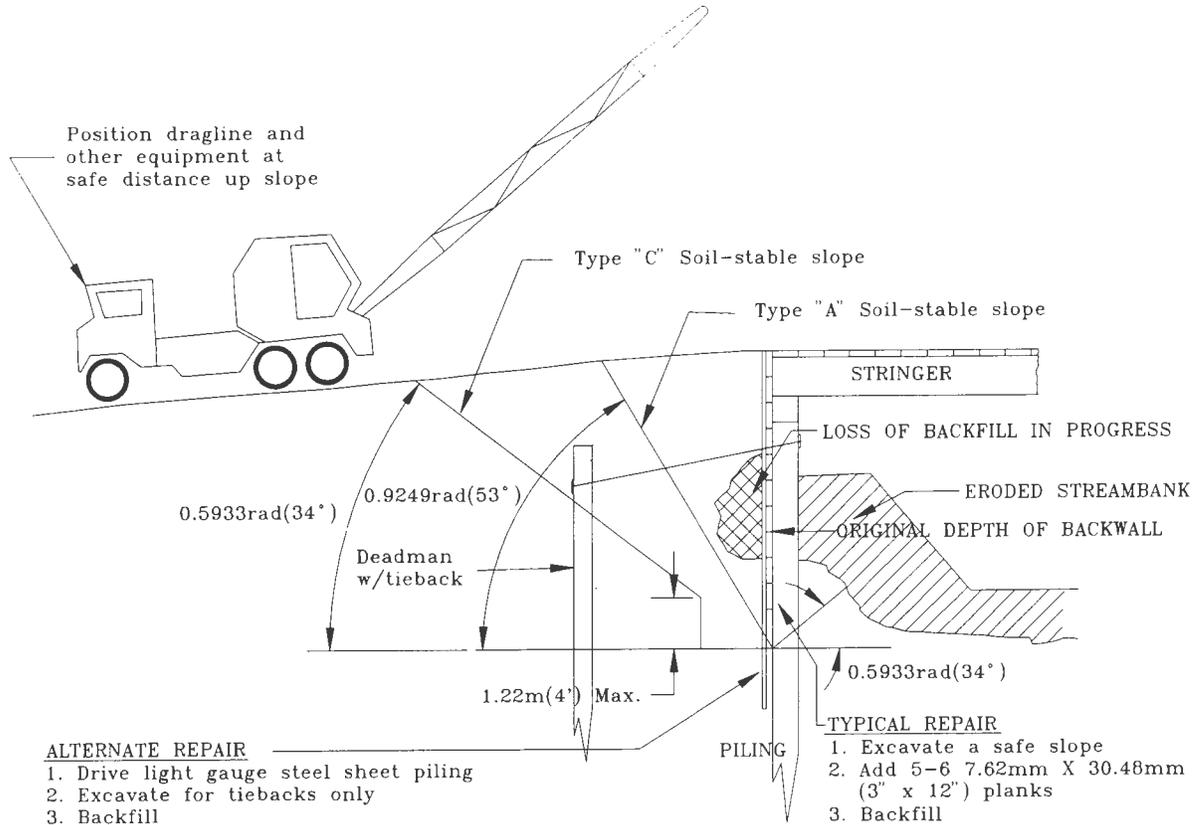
Typical timber bridge abutment: descriptions of and pertinent items relating to bridge backwall repair.
